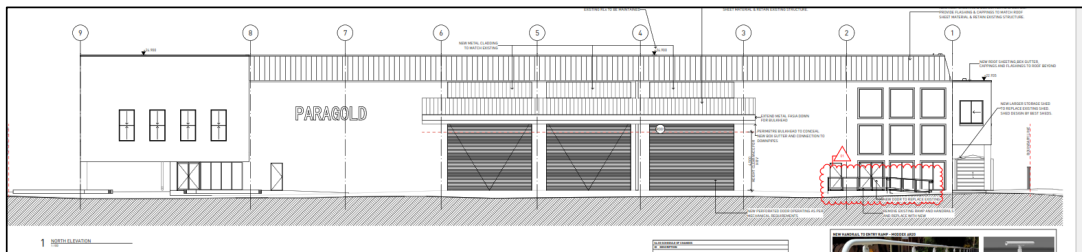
Proposed ramp reconstruction along northern elevation of existing depot at 1-7 Green Street, Banksmeadow.
